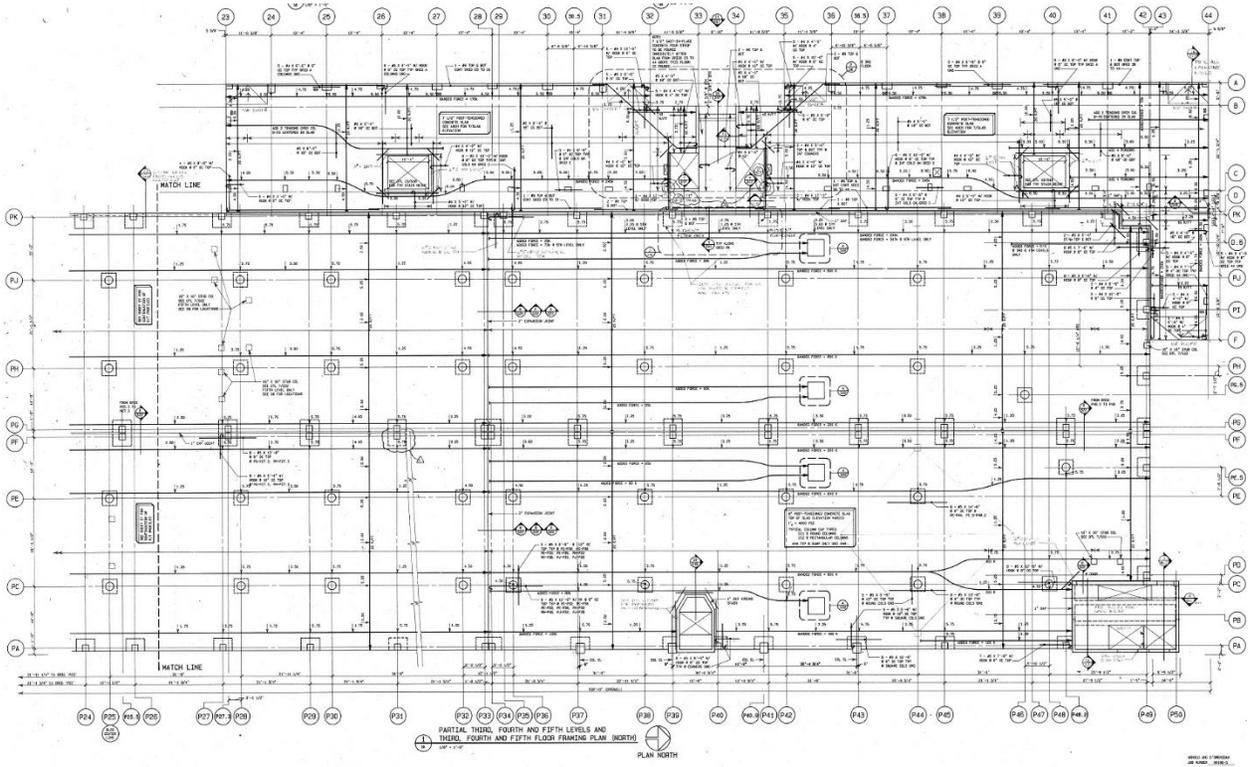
Plan view of northern half of a typical floor of the Church Street Parking Garage.
